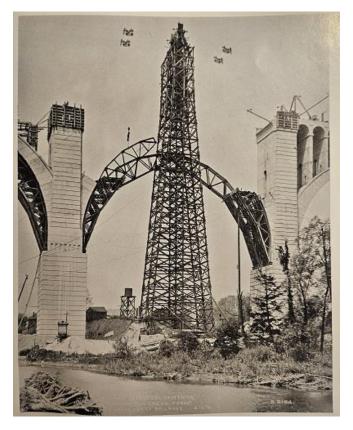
The tower used to transport concrete along the Tunkhannock Viaduct for pouring via cable-mounted buckets, spring 1915. *Source: NAL (1976).
